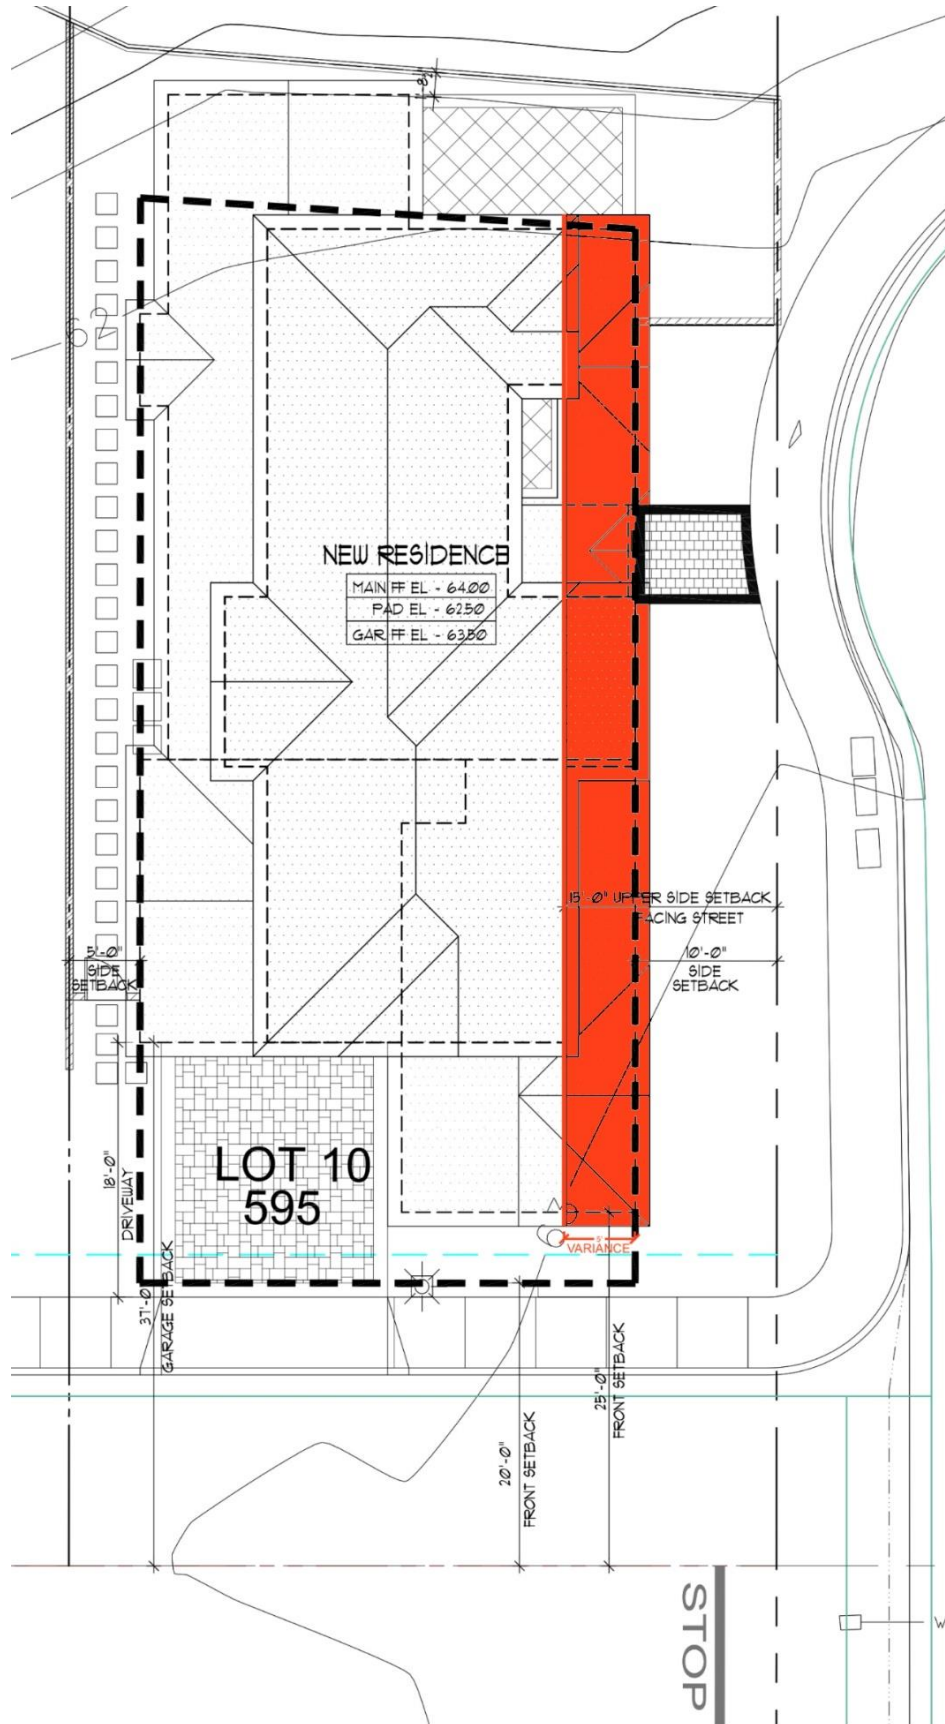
EXHIBIT B – Site Plan With Variance Request Highlighted in Red
